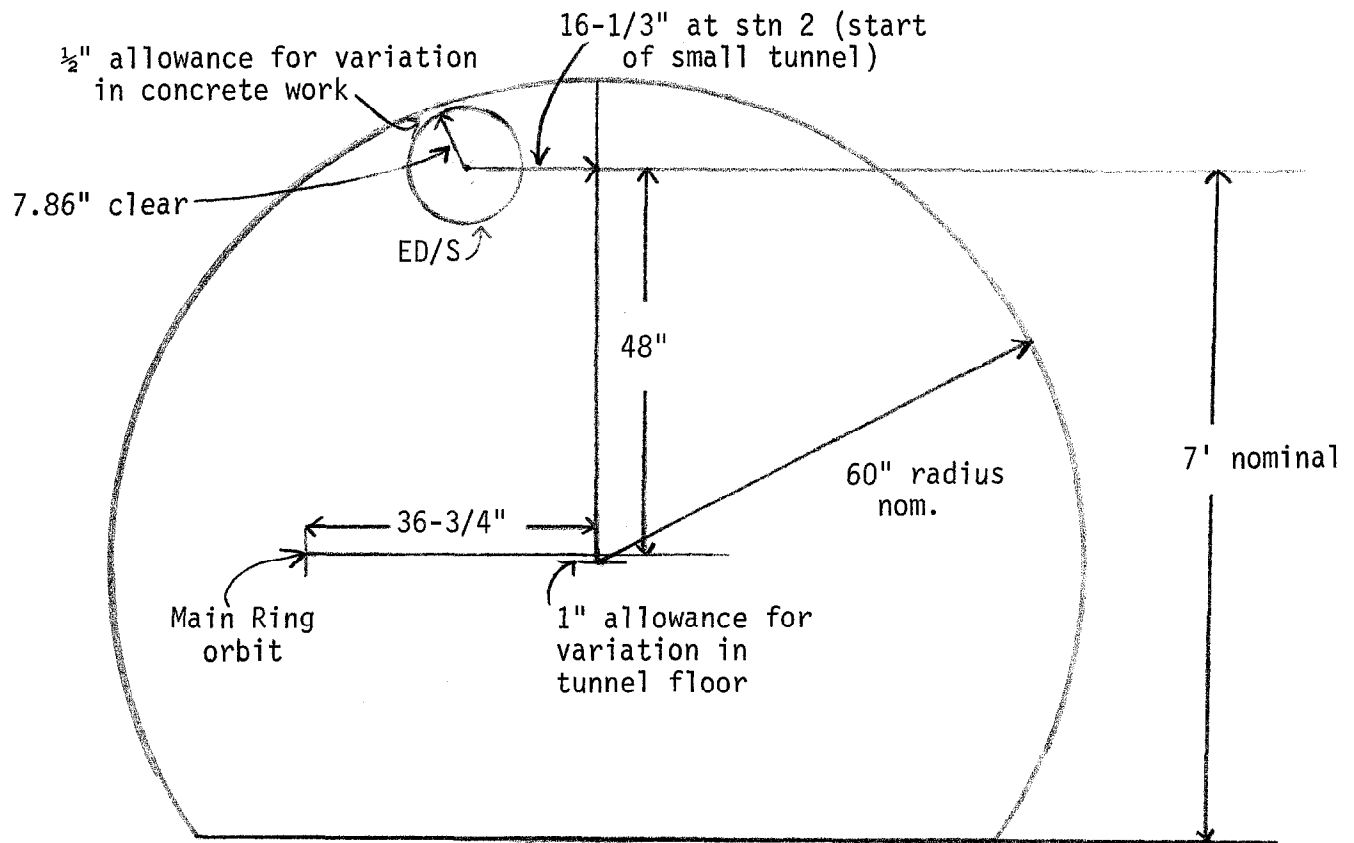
Cross section through main accelerator enclosure at Station 2, where point of closest approach of ED/S to tunnel wall occurs. After 1" allowance for variation in elevation of floor and  $\frac{1}{2}$ " for variation in concrete work of the wall, clearance remaining for ED/S is 7.86".
